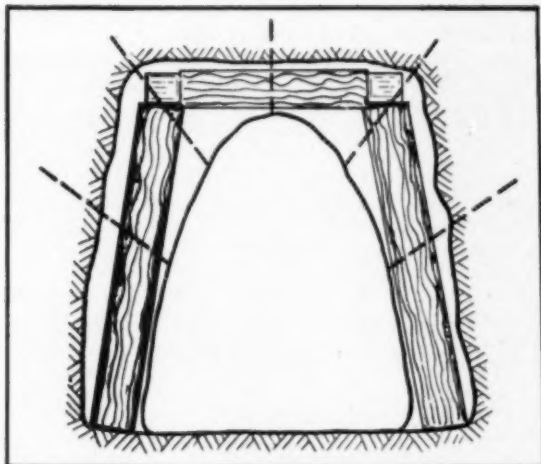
A 9x7-ft rock-bolted cross-section superimposed on an 11x9-ft timbered cross-section.
